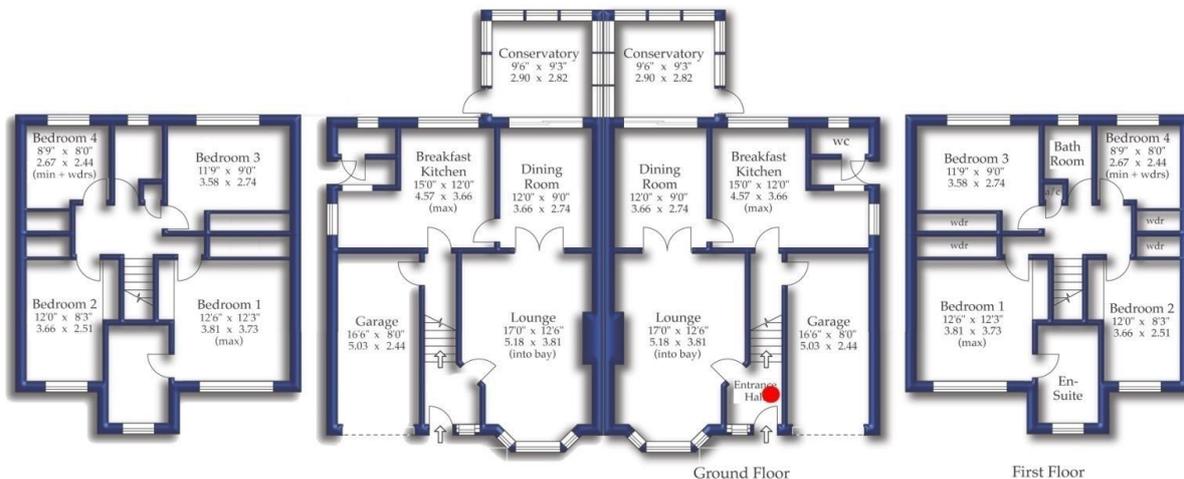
Floor plan of a semi-detached house
